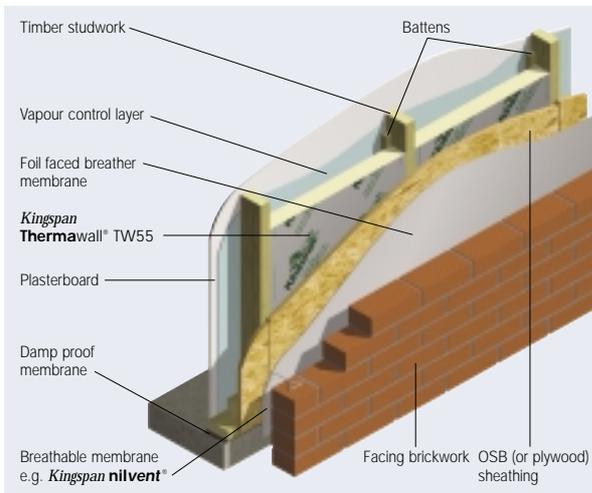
External Masonry – Timber Frame Wall with Insulation Between Studs (Utilising Foil Faced Breathable Membrane)
